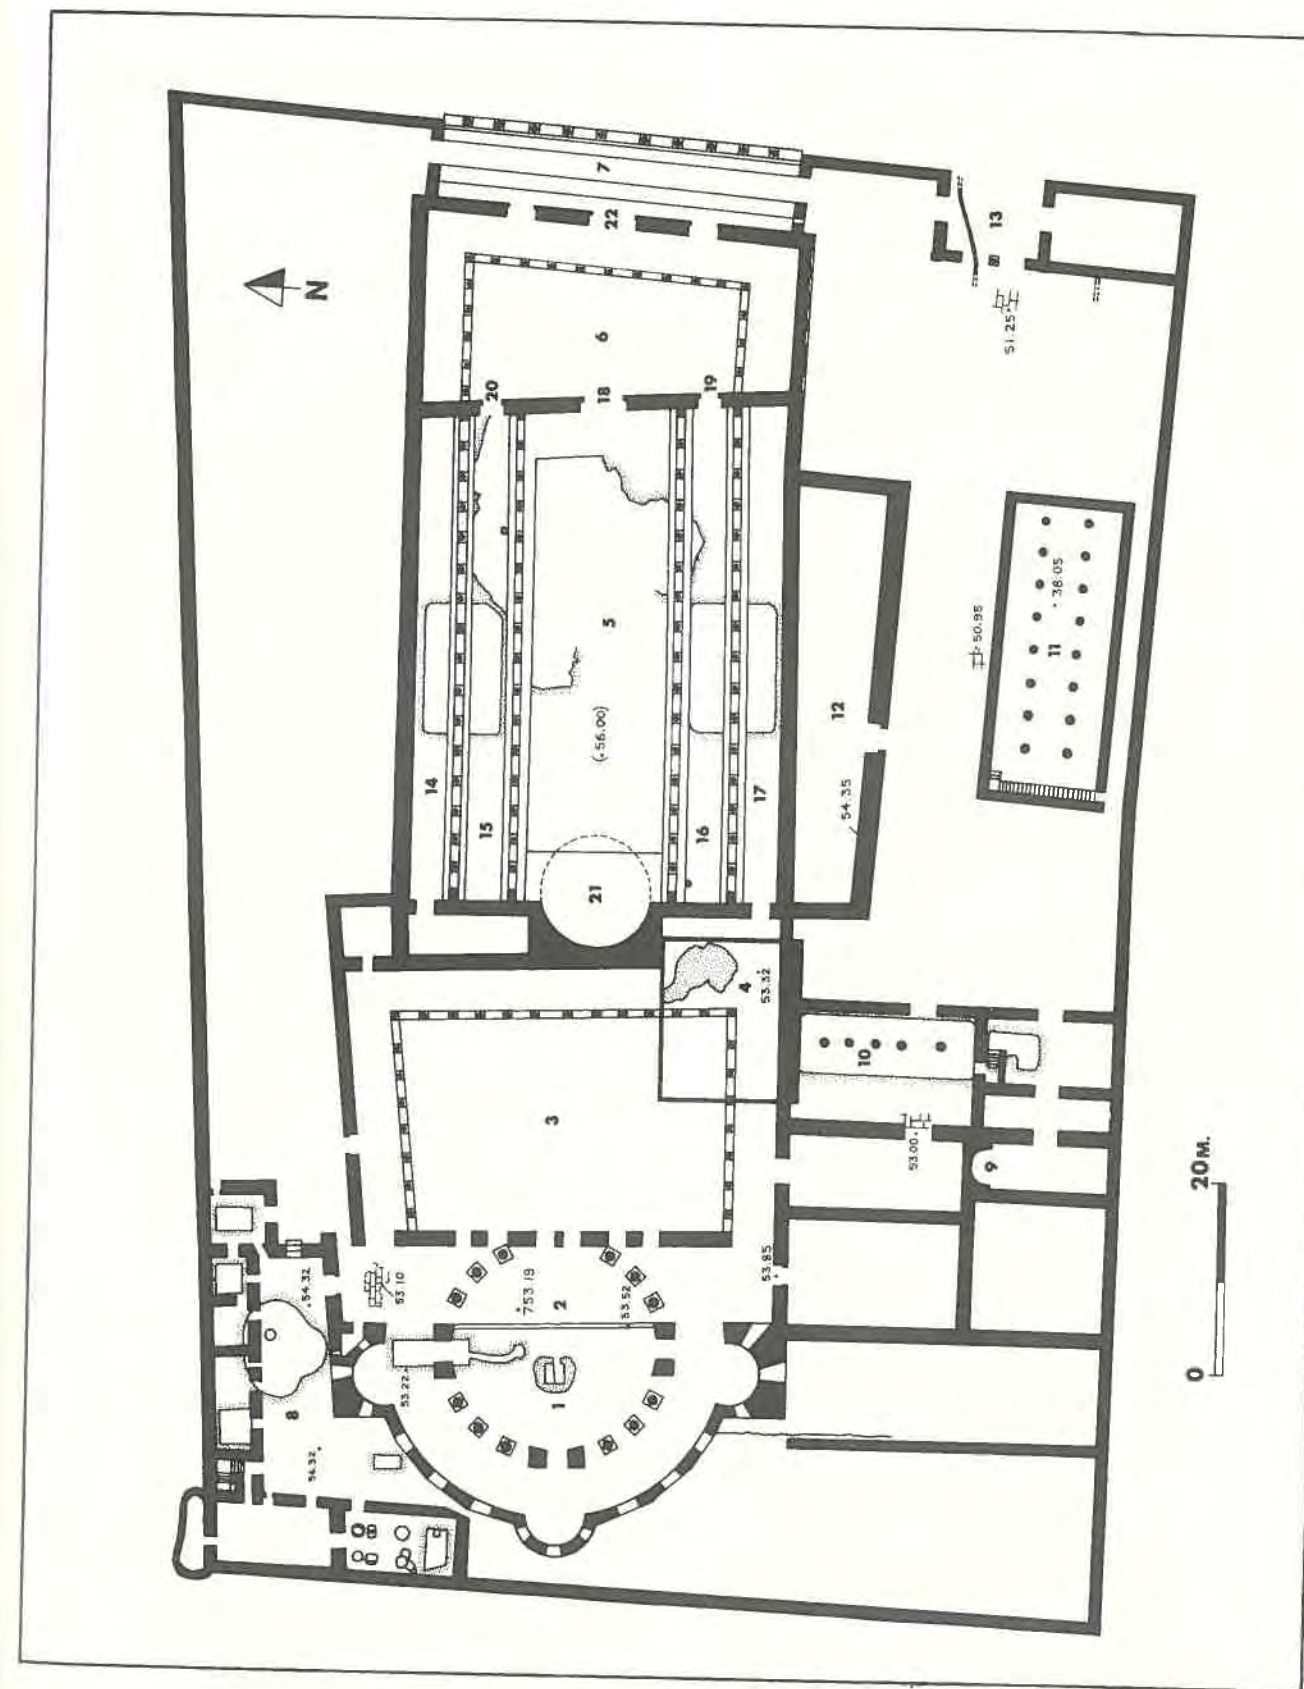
Reconstruction of the plan of the Byzantine church complex. (S. Gibson).
